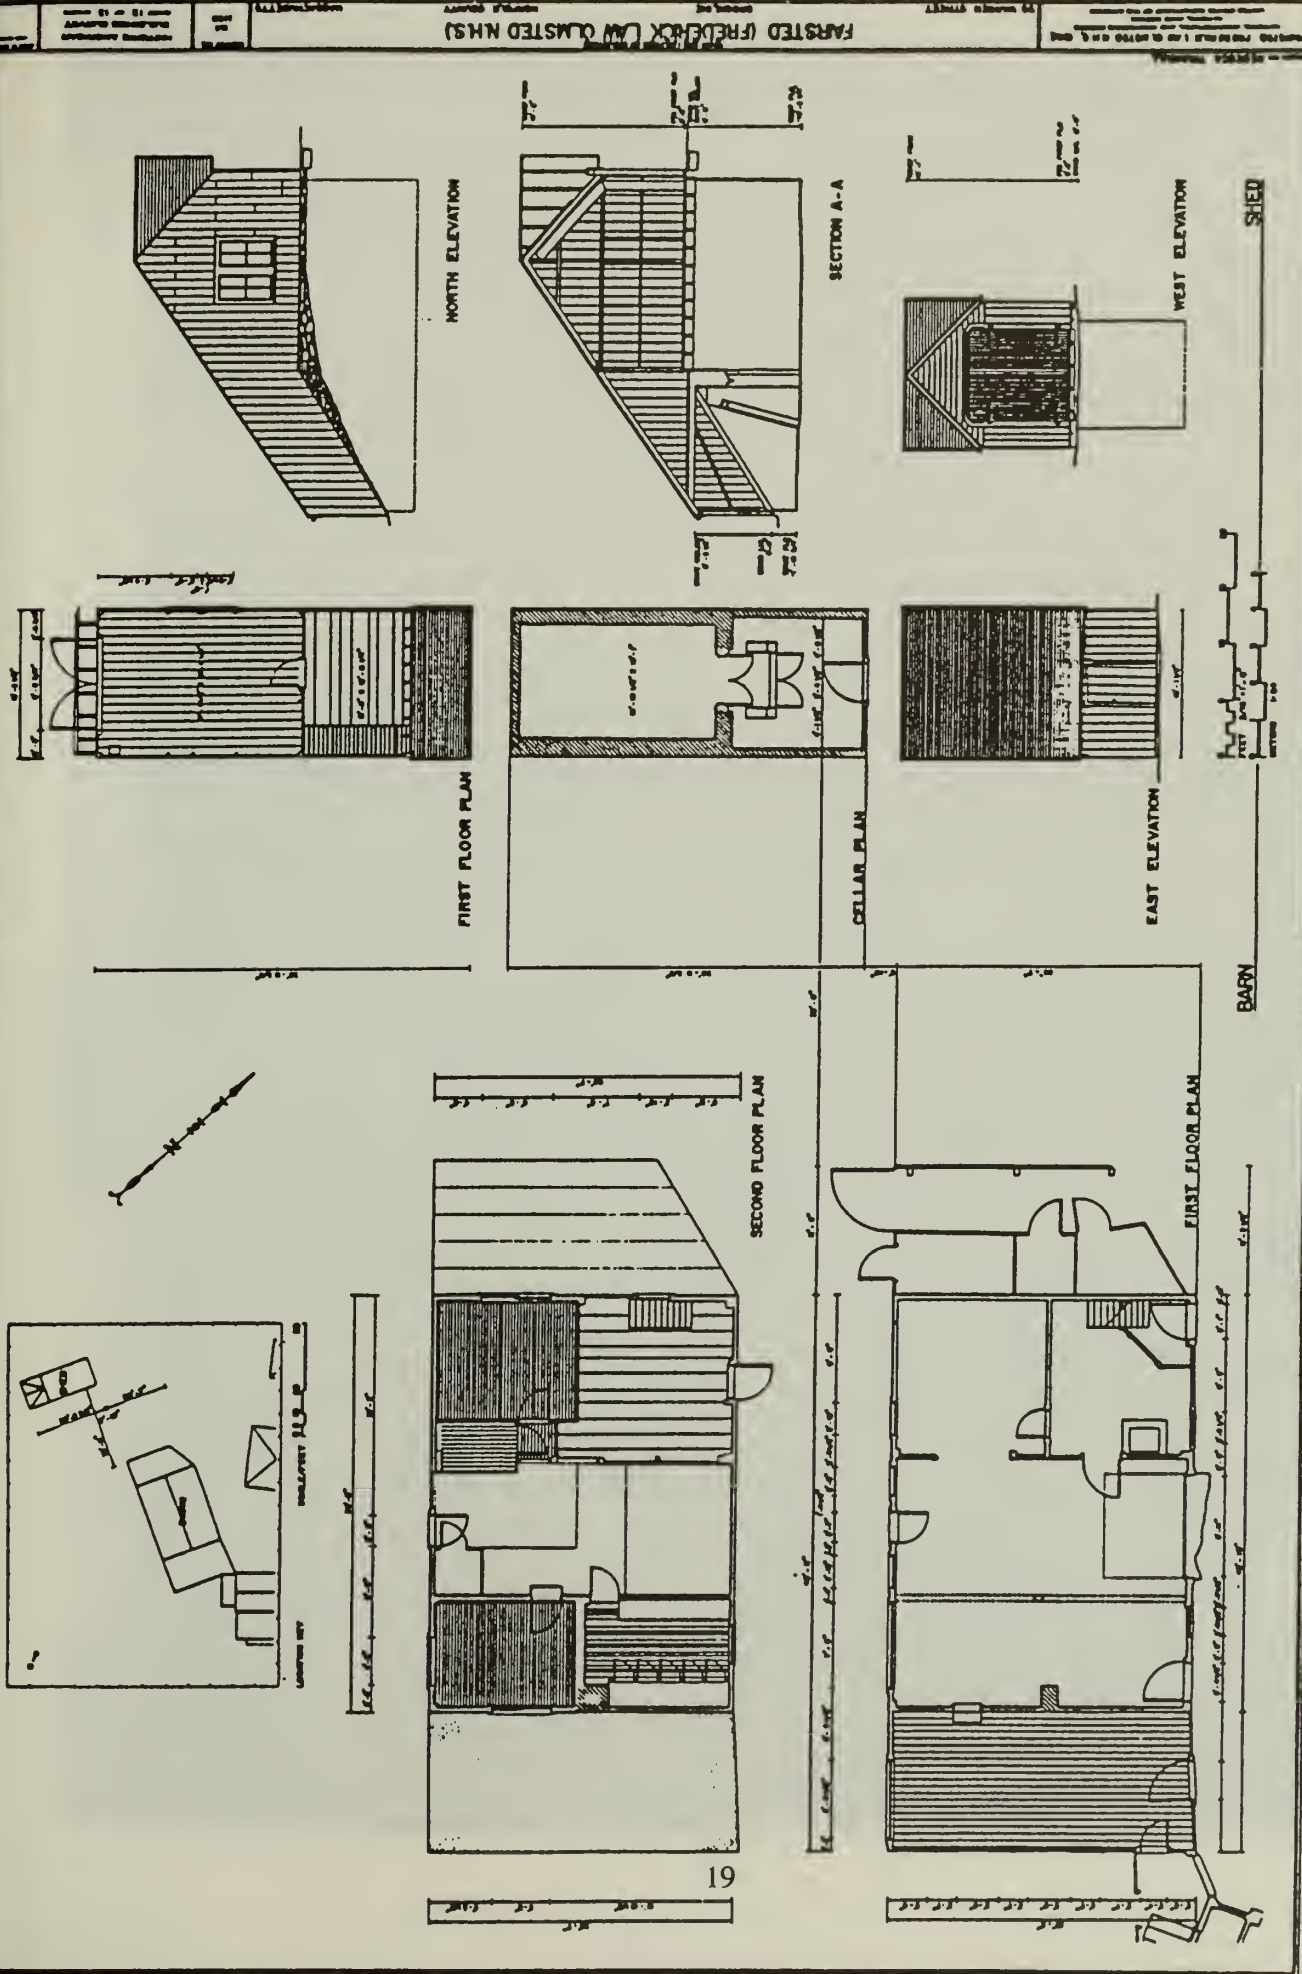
Plans, elevations, and sections for the barn (at left), 1982.
